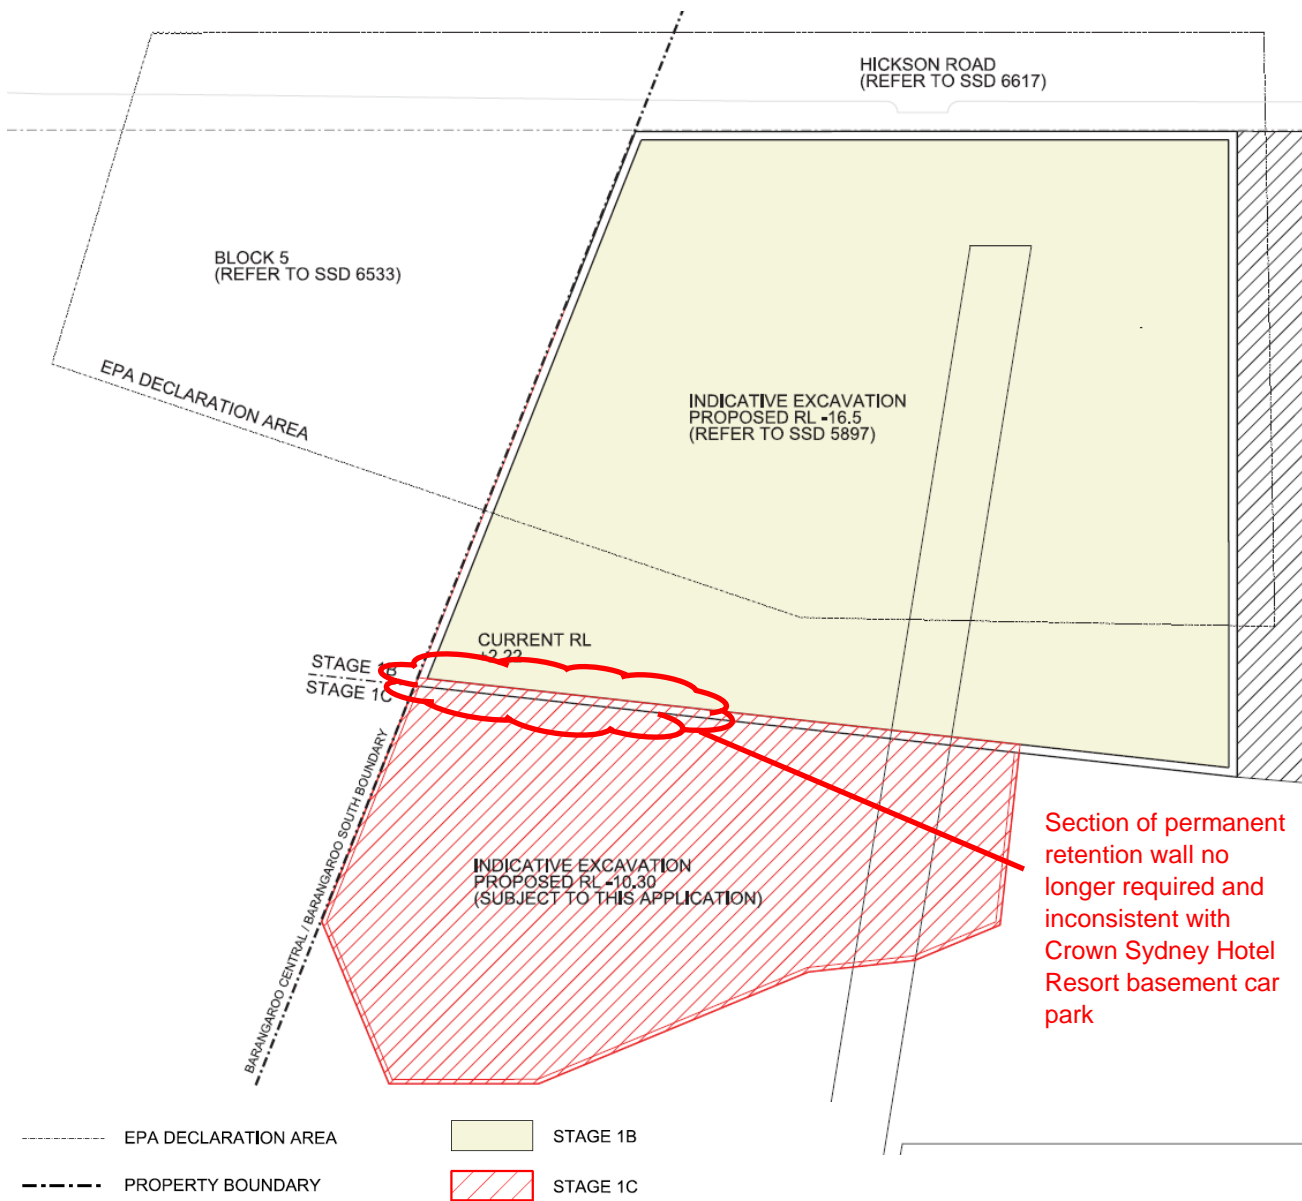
Approved extent of Crown Sydney Hotel Resort retention wall system and excavation area (Stage 1C)
